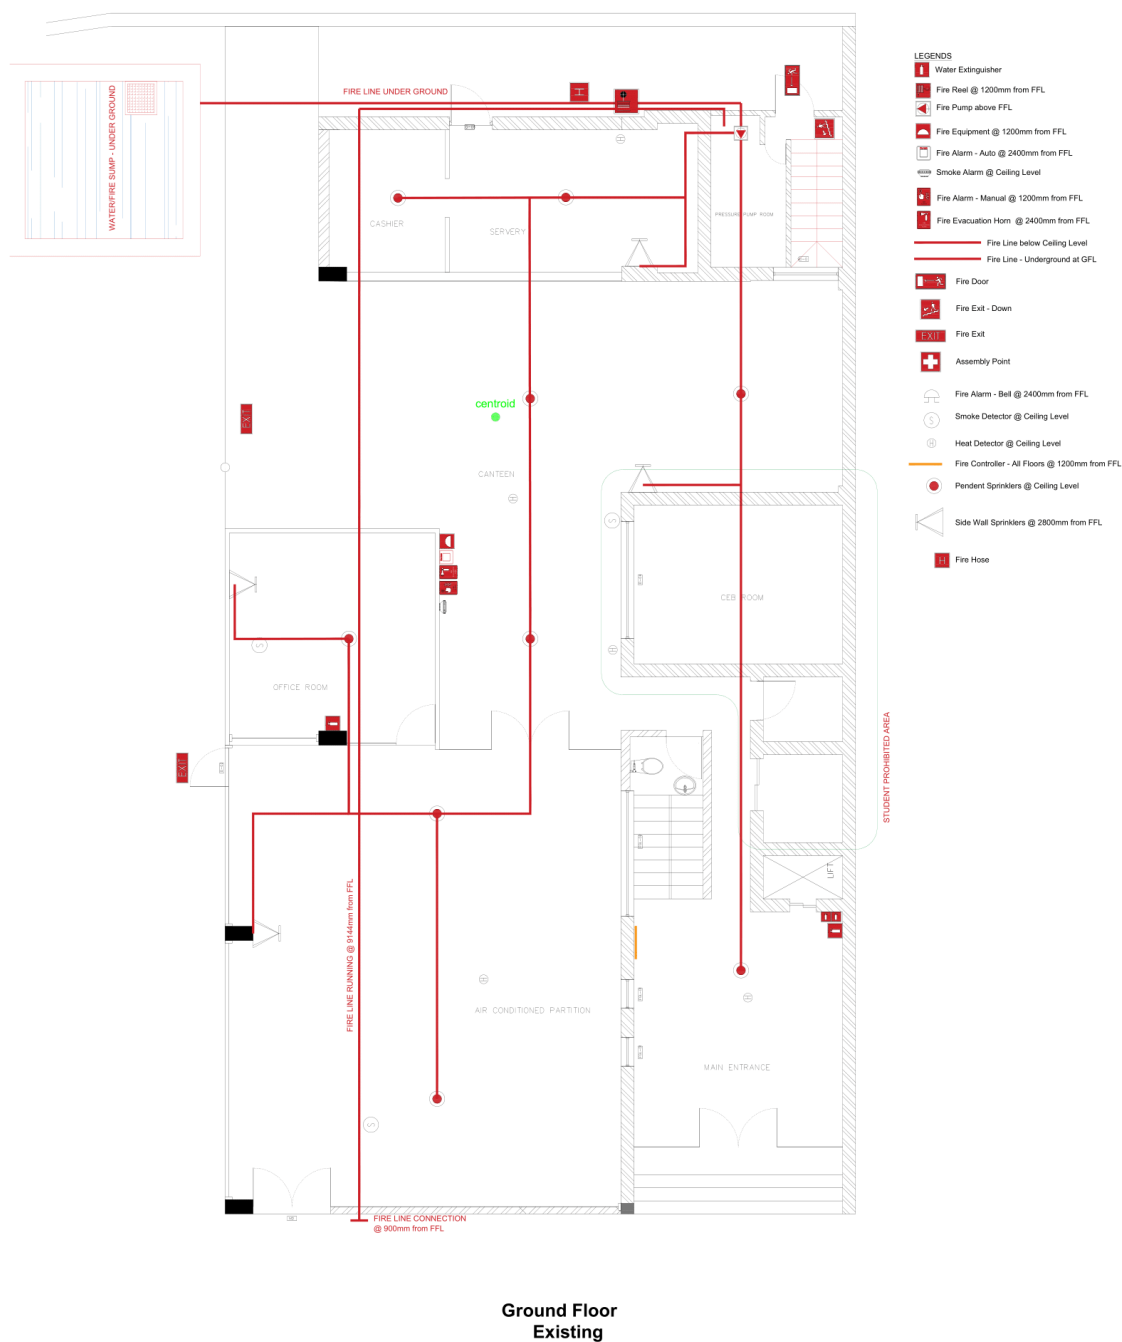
NIC ground floor plan with center point (AutoCAD 2023)
